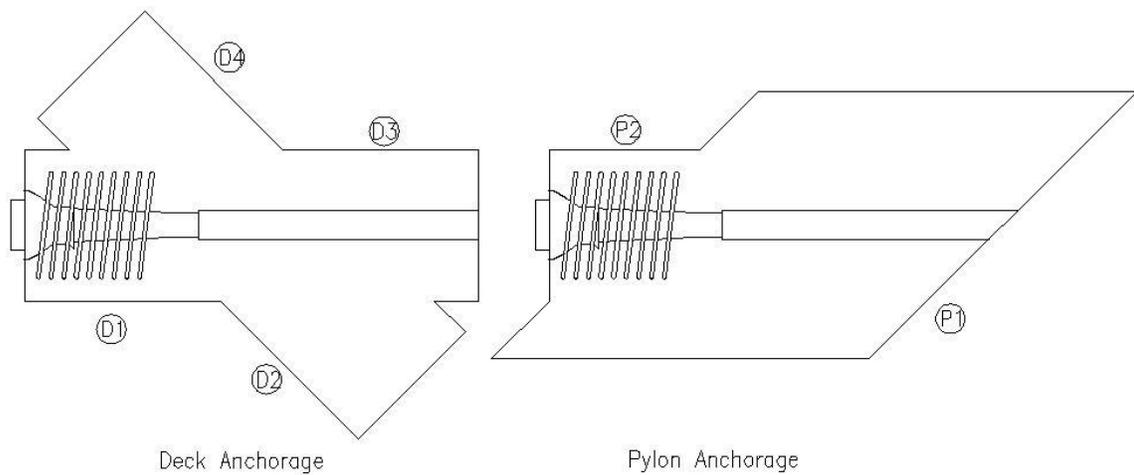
Testing Grid Labels for UST Testing of Anchorages
